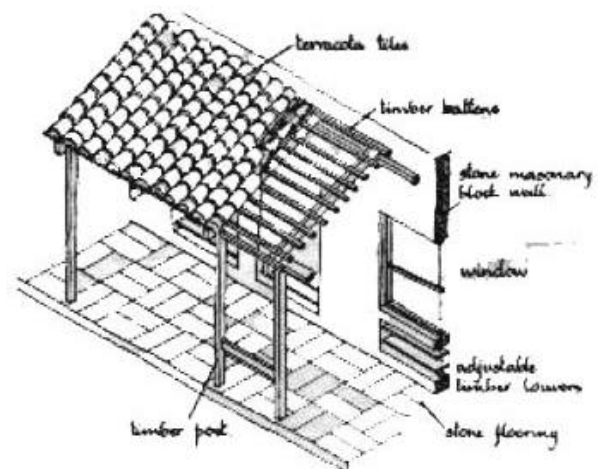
Cut-away section through a passage roof and office space wall. Adjustable louvers have been provided below the window
